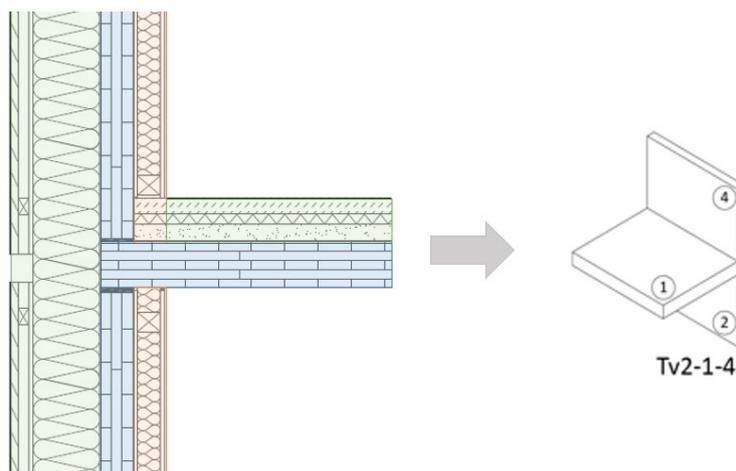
Example of a junction detail for cross laminated timber elements with a slab and two walls as flanking elements: the core layer determines the junction type Tv2-1-4
